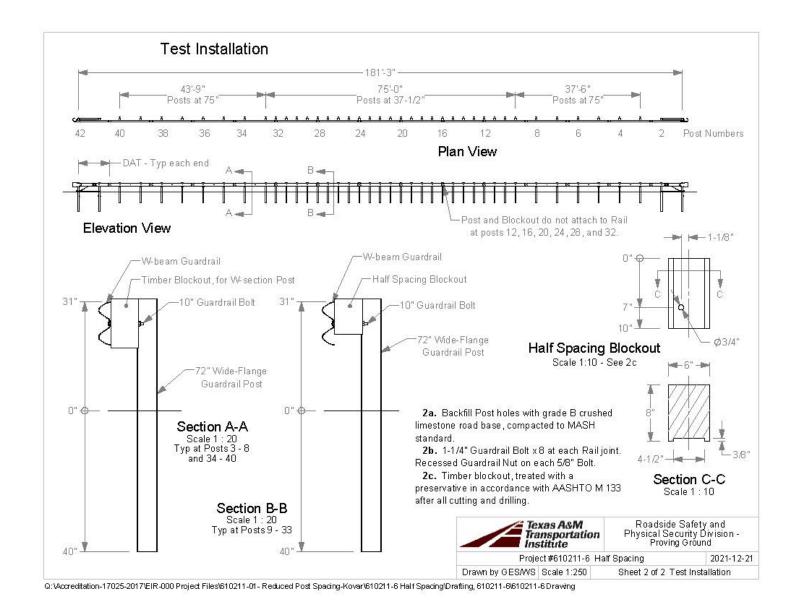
Details of the MGS with Half Post Spacing and Shortened Blockouts.
